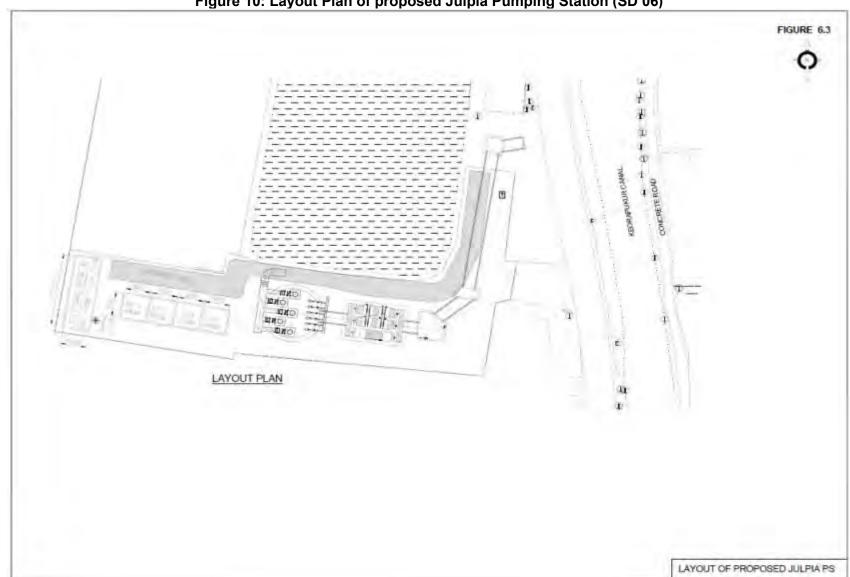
Layout Plan of proposed Julpia Pumping Station (SD 06)
